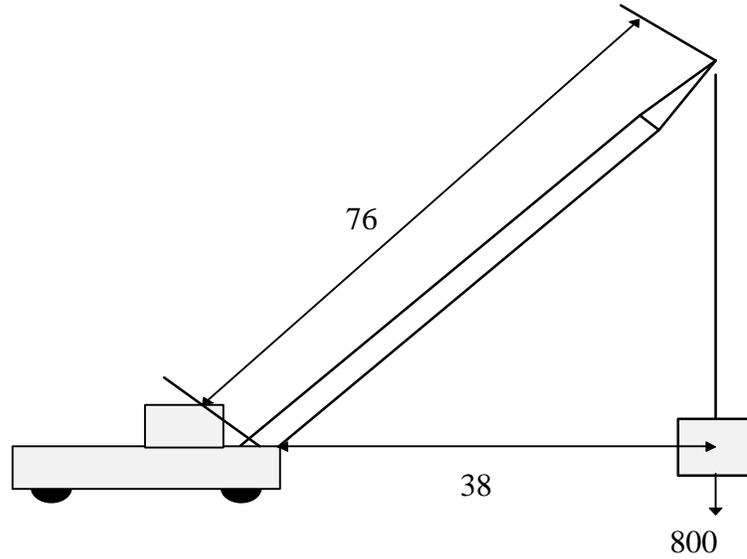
Test 5, Perpendicular - Dimensions Of Test
